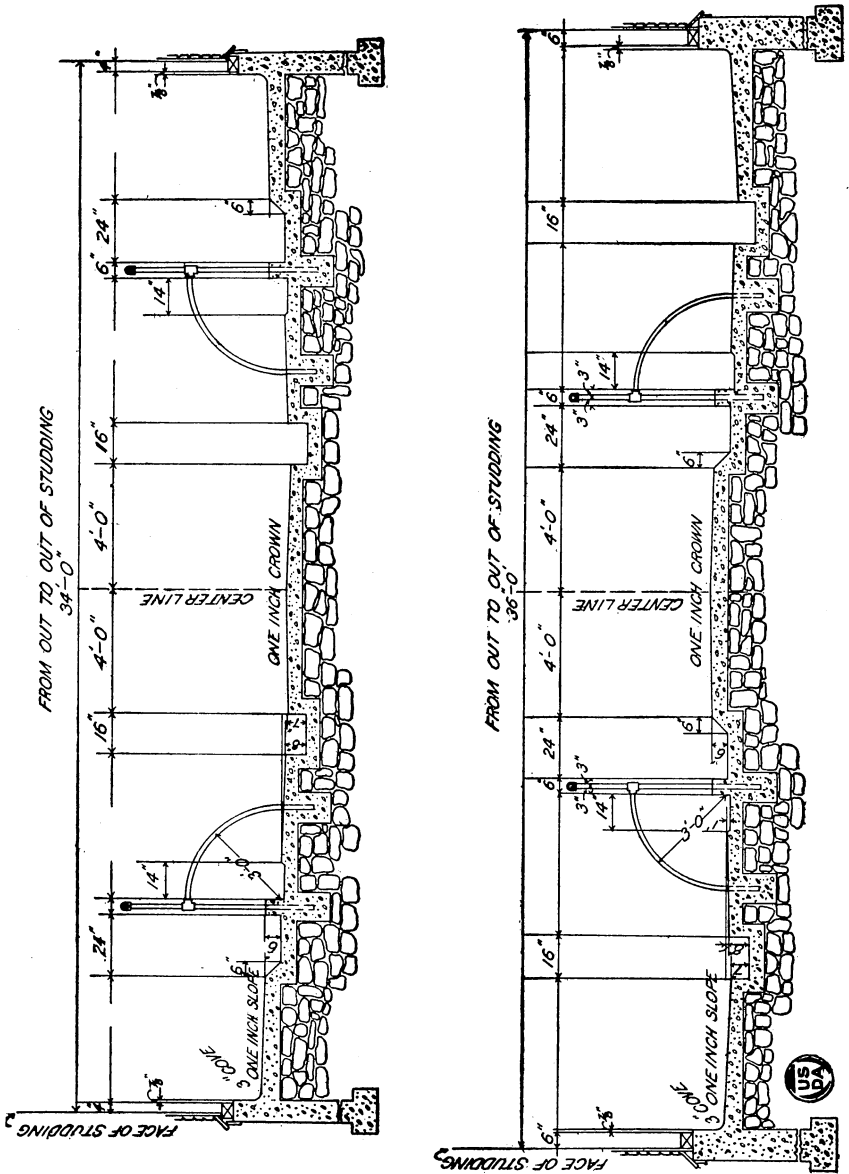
Cross sections of stables with cows facing out and cows facing in.
